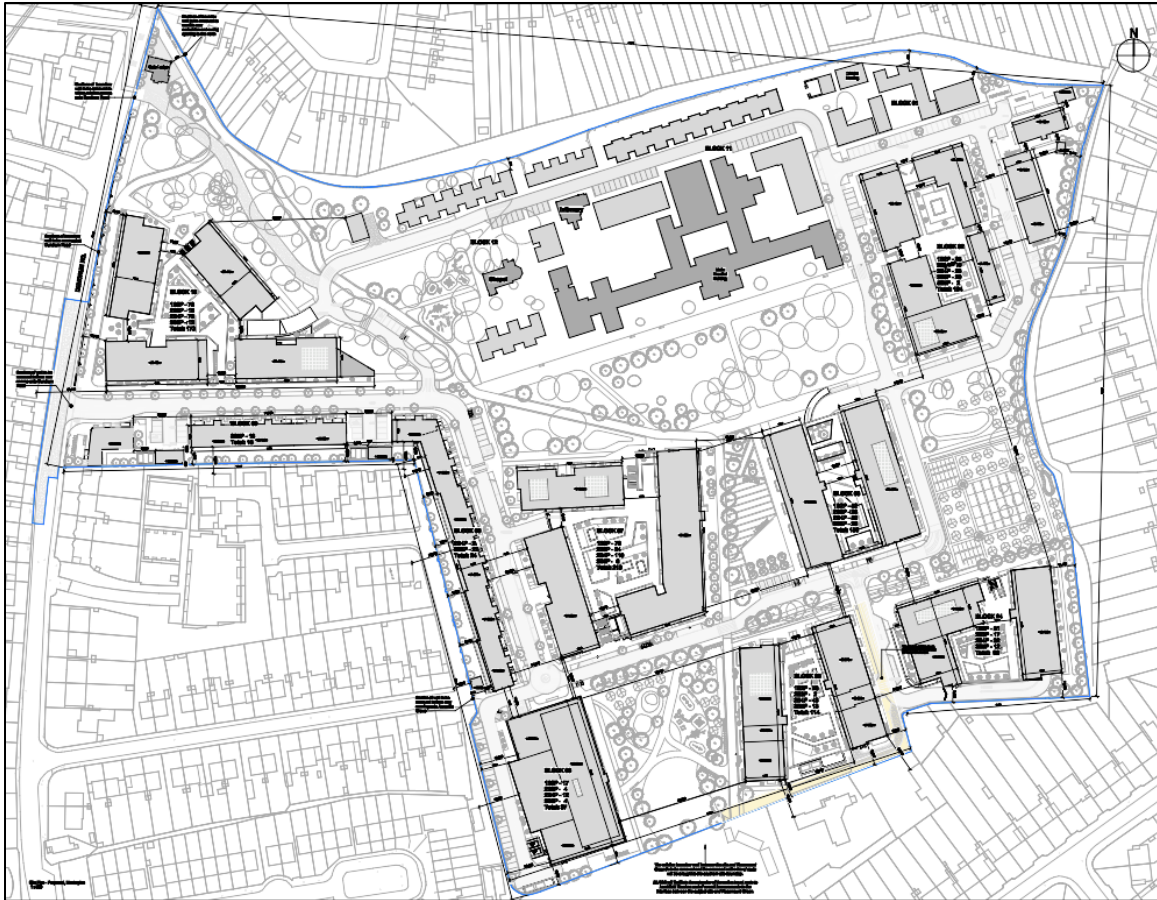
Extract from the Proposed Masterplan Site Plan prepared by Reddy A+U Drawing No. DCD-02-SW-ZZZ-DR-RAU-AR-1050 P3S-1
